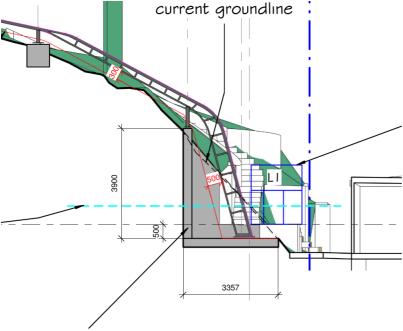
Extract from submitted Architectural Plans indicating location and depth of excavation.
